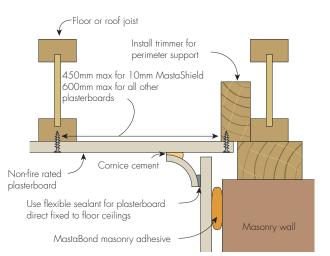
Ceiling to Masonry Wall Direct fixed to joist
